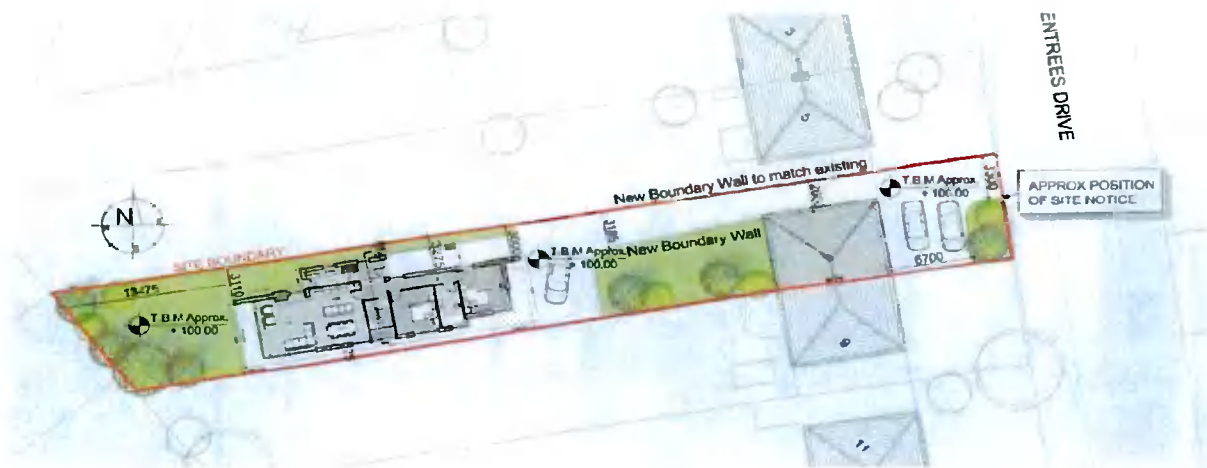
Site Plan of Previously Granted SD18A/0292 – 7 Greentrees Drive
